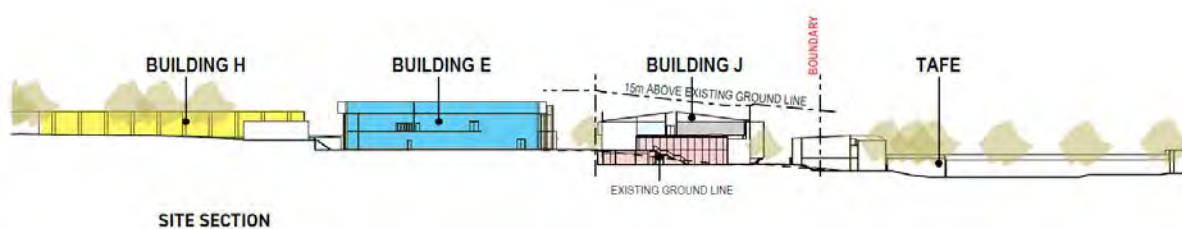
Site Section showing overall massing of Building J in context of the existing buildings, and the general extent of basement excavation area (Source: Lahznimmo Architects, MDC SSDA Design Report, 7.8.2020)
